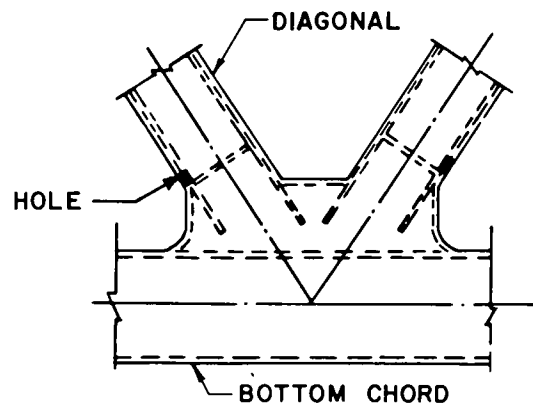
Bottom chord joint of main truss. [Yamada 1983]
